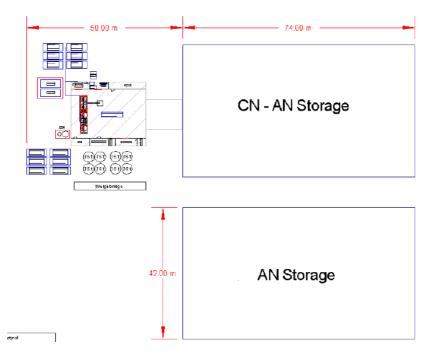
Draft layout plan (to be finalised prior to submission of planning application)
